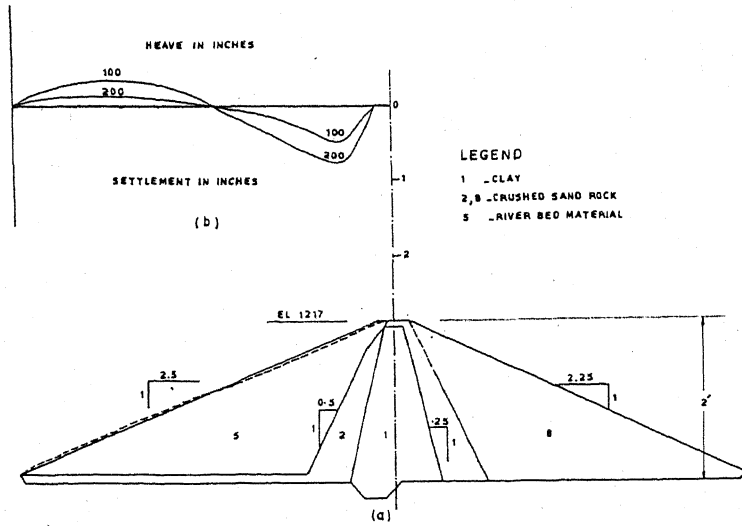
CENTRAL CORE SECTION TEST FOR U/S STABILITY FULL RESERVOIR
